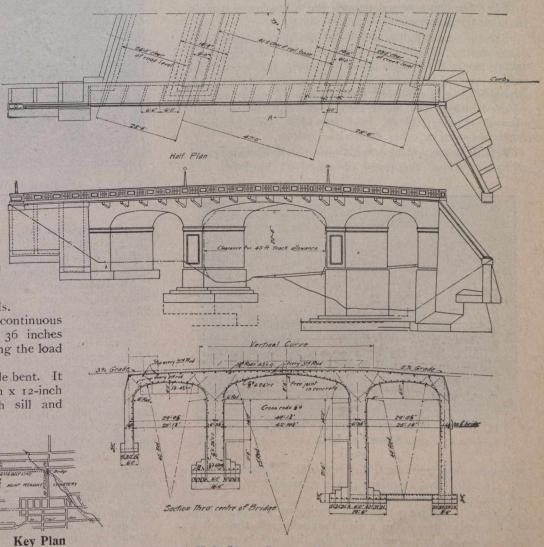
Half Plan, General Elevation and Longitudinal Section
